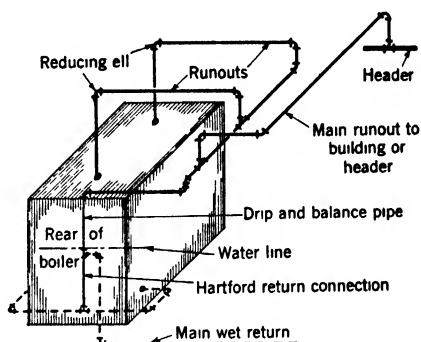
APPROVED METHOD OF BOILER CONNECTIONS
